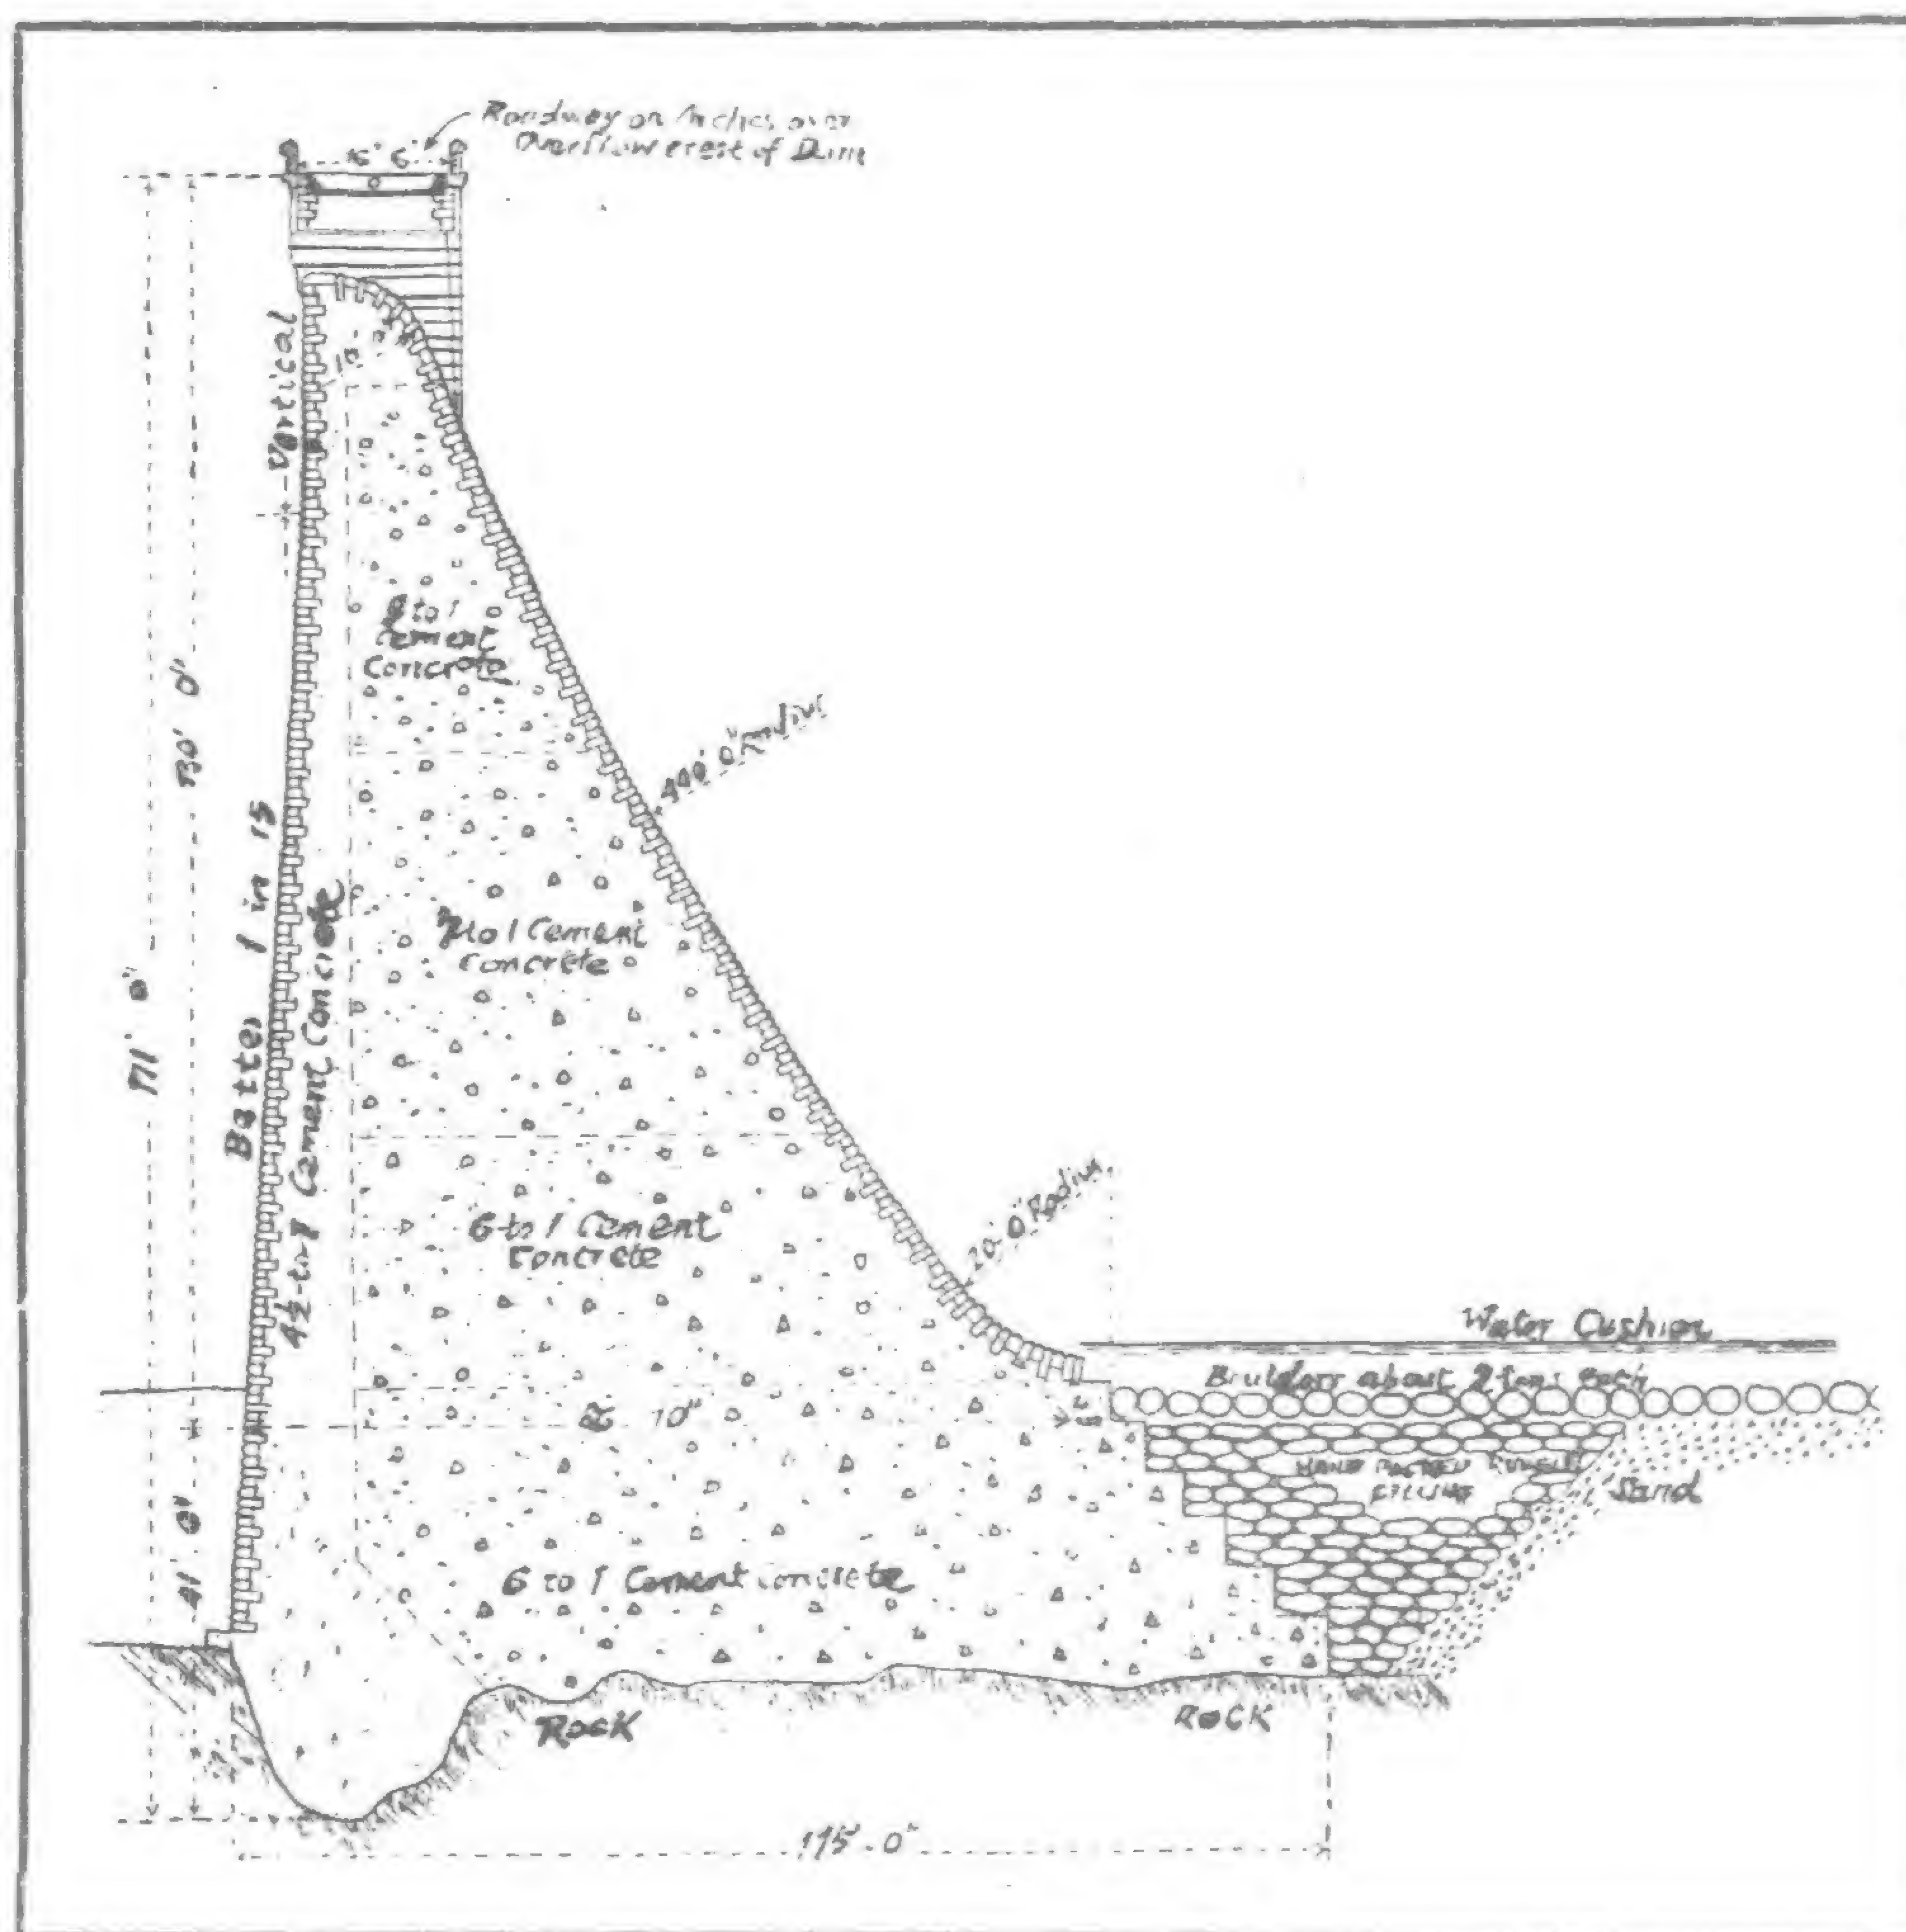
Tytam Tuk Dam. Cross section at overflow
